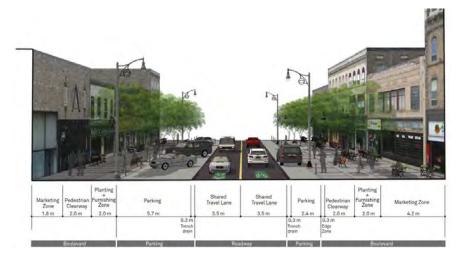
2-Lane with Shared Use Lanes and Angled Parking (Source: City of Guelph Downtown Streetscape Manual & Built Form Standards, 2014)
